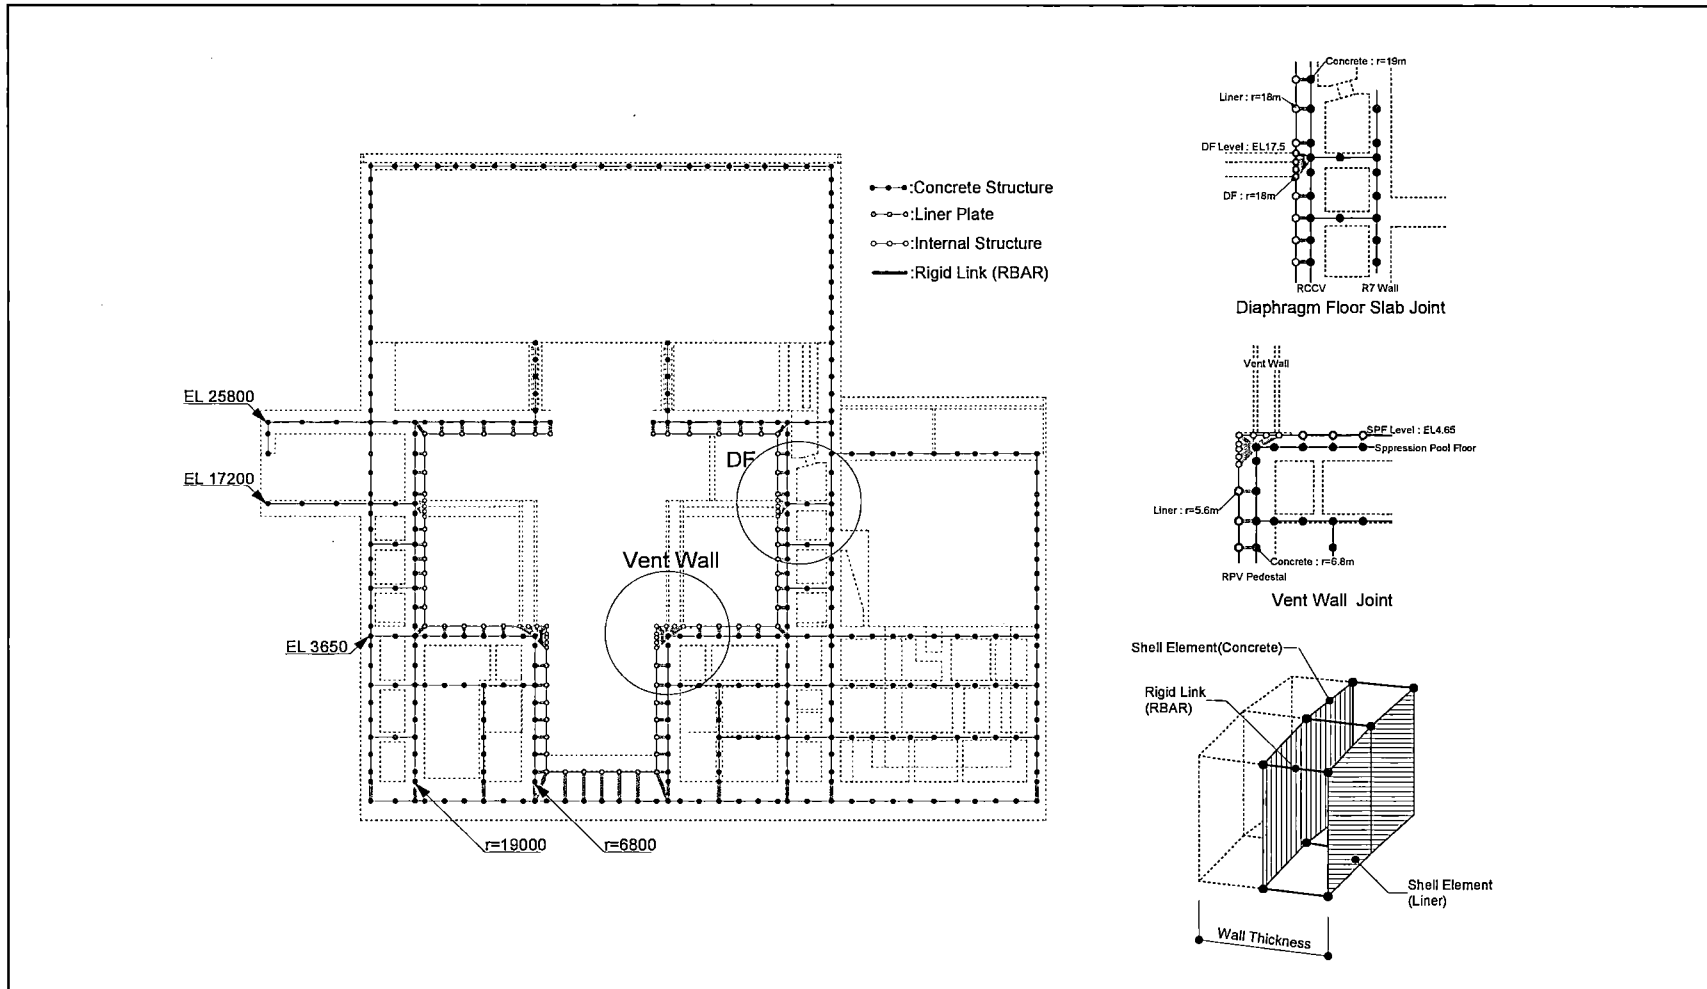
Rigid Bar Elements between Concrete and Liner
